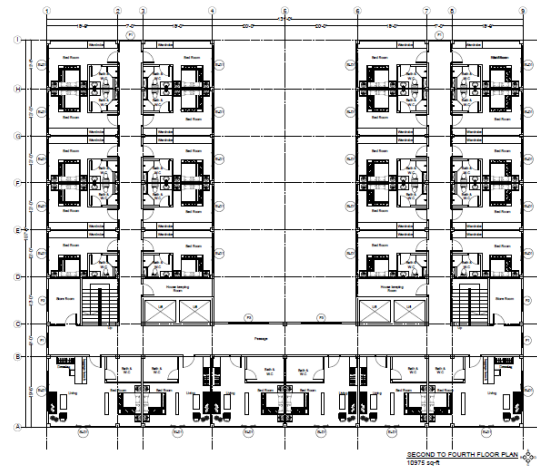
Architectural View for 1<sup>st</sup> to 4<sup>th</sup> Floor Plan
